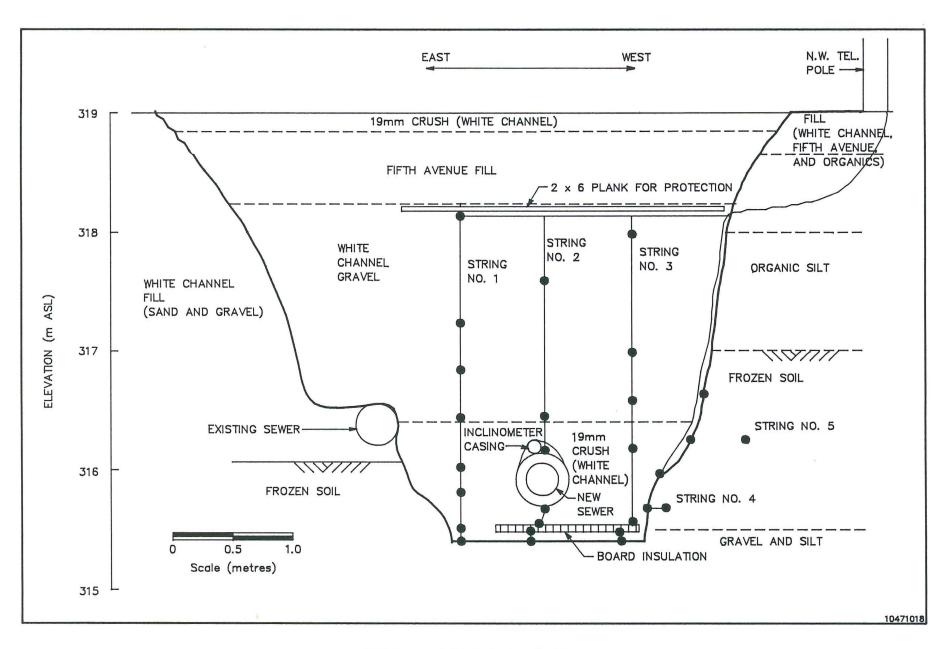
THERMISTOR SUITE #1 BLOCK HF – LOT 15, FIFTH AVENUE INSTALLED CONFIGURATION CROSS-SECTION FACING SOUTH
